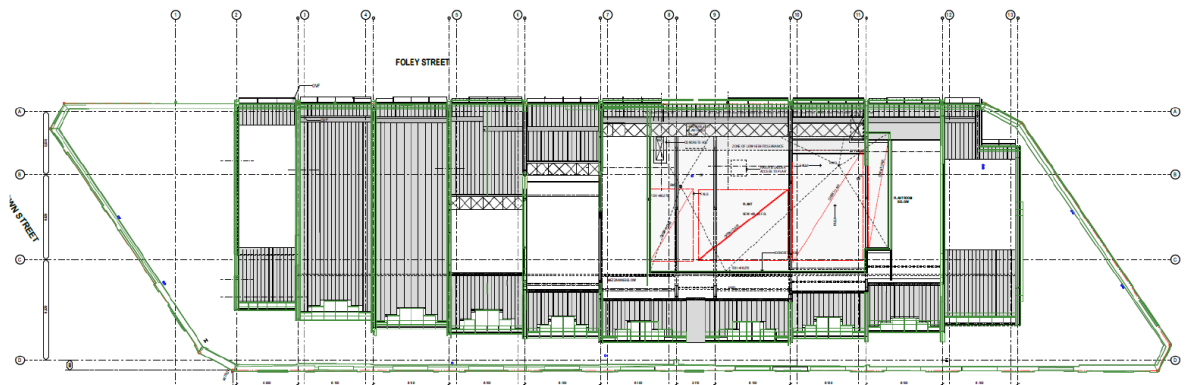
Comparison between the approved plant level and the proposed plant level showing adjustments as a result of the new lift core location
